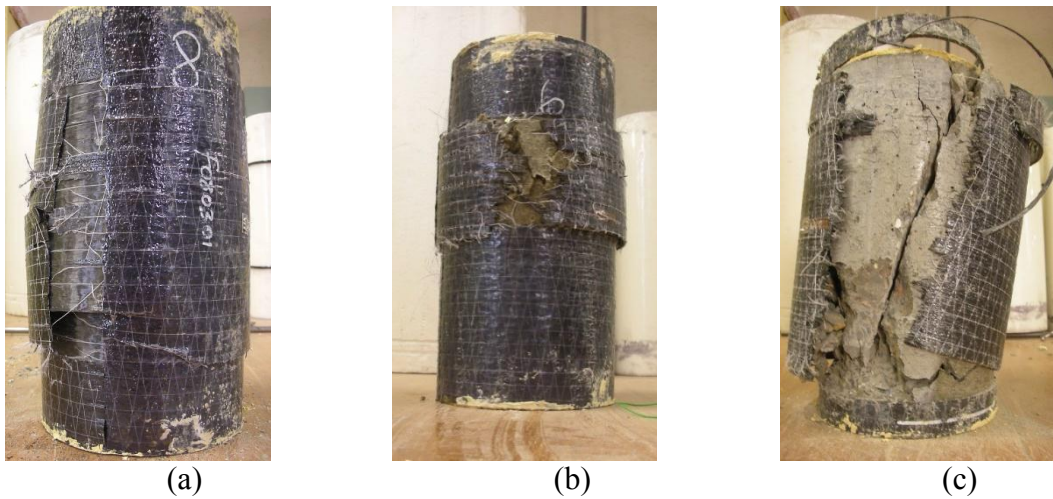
Failure modes of DSTCs: a) bond failure, b) localized hoop rupture, c) global rupture
